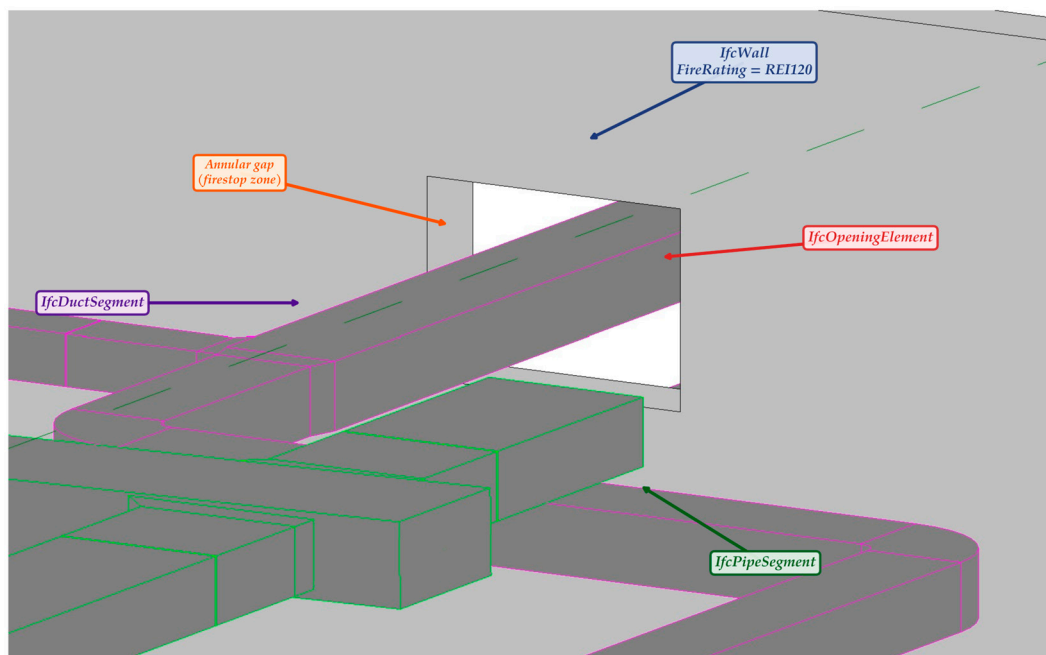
3D BIM model of an MEP duct penetration through a fire-rated reinforced concrete wall, modeled in Autodesk Revit 2025. Source: own elaboration.
